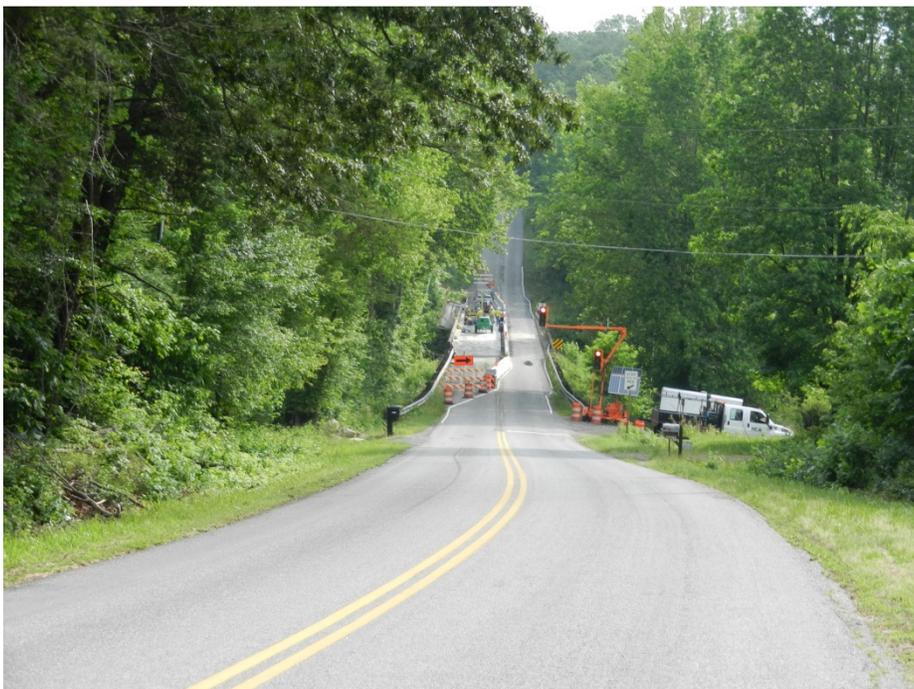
Moorefield Bridge Road Bridge Over Sandy River
